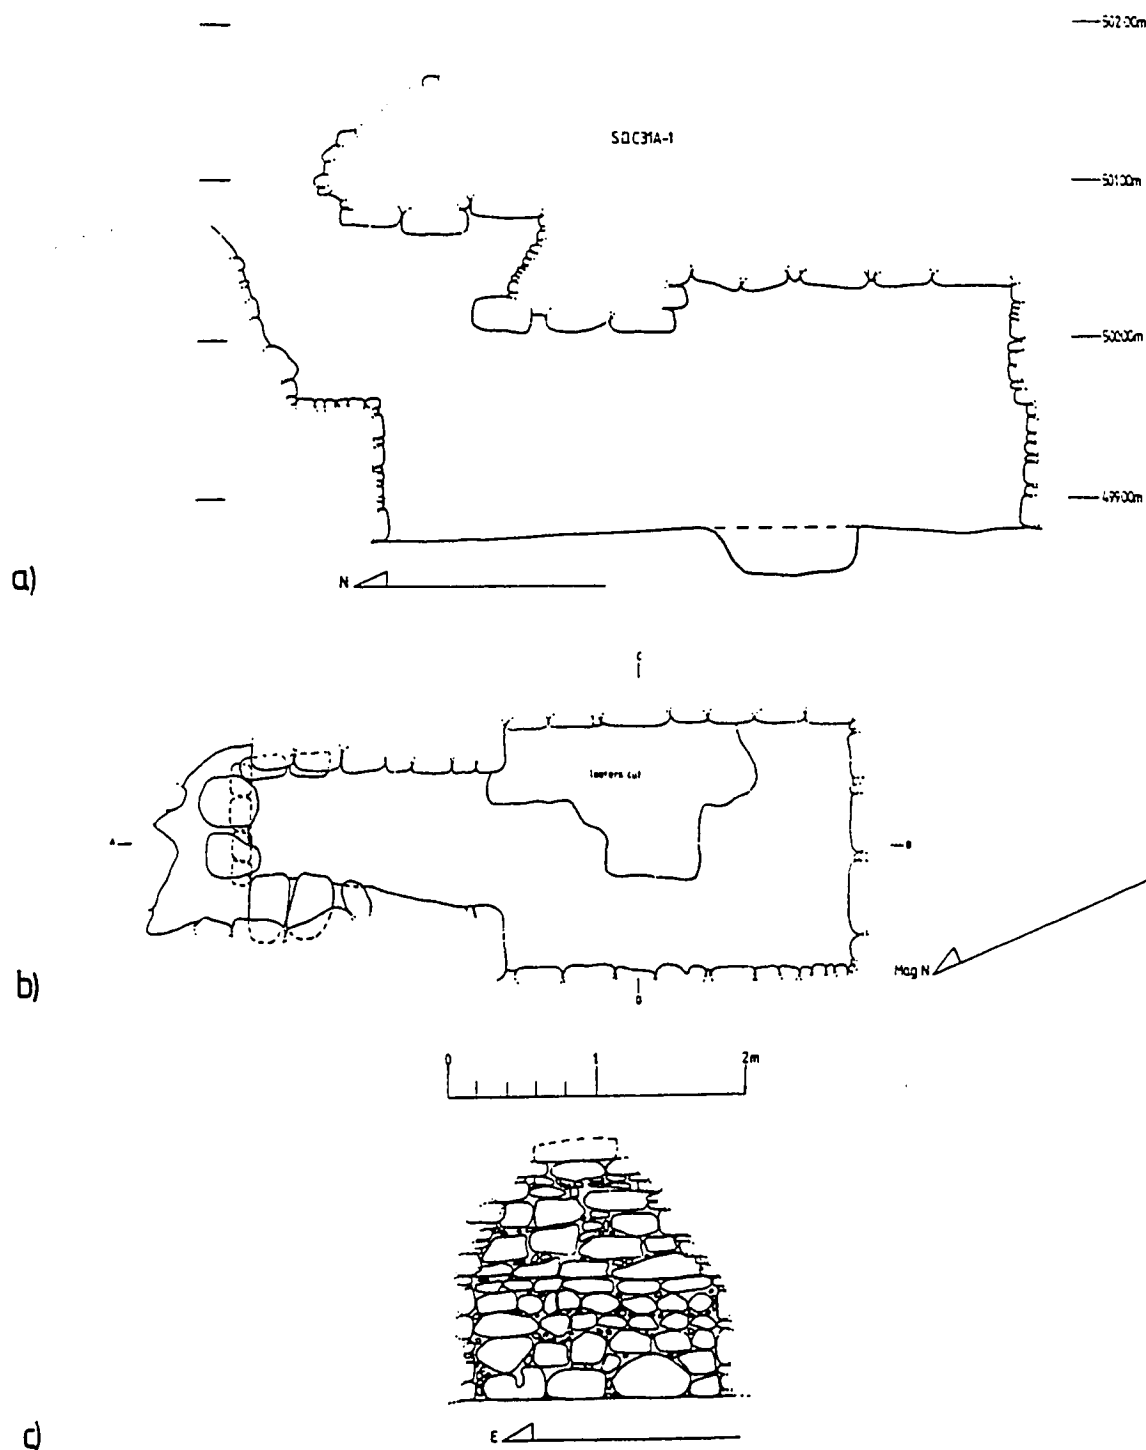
Structure 2E20 Special Deposit C31A-1 - a) north-south section; b) plan of the chamber and entrance, A-B refers to the section and C-D refers to the cross-section, c) elevation of the south wall.
